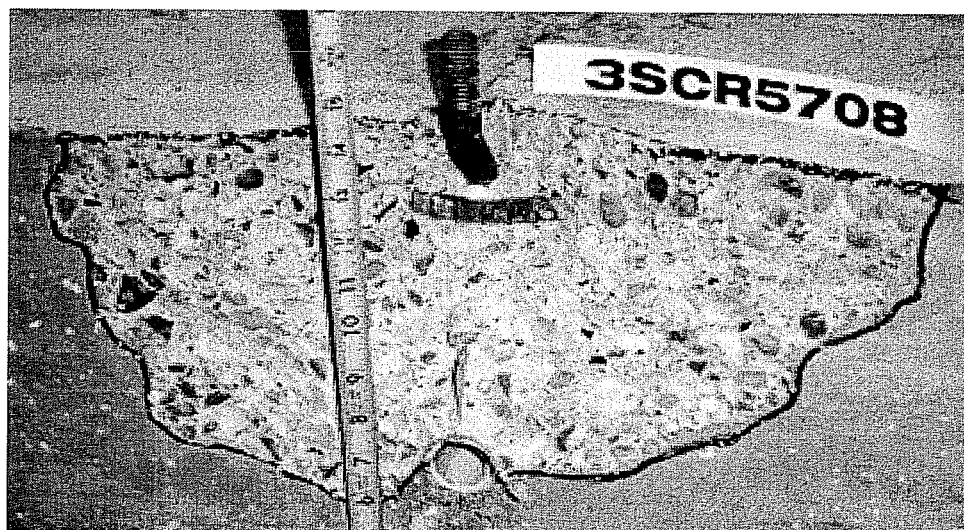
Typical Failure Cone for Cast-in-Place Single-Anchor Connection with Close Hairpin Loaded in Shear
